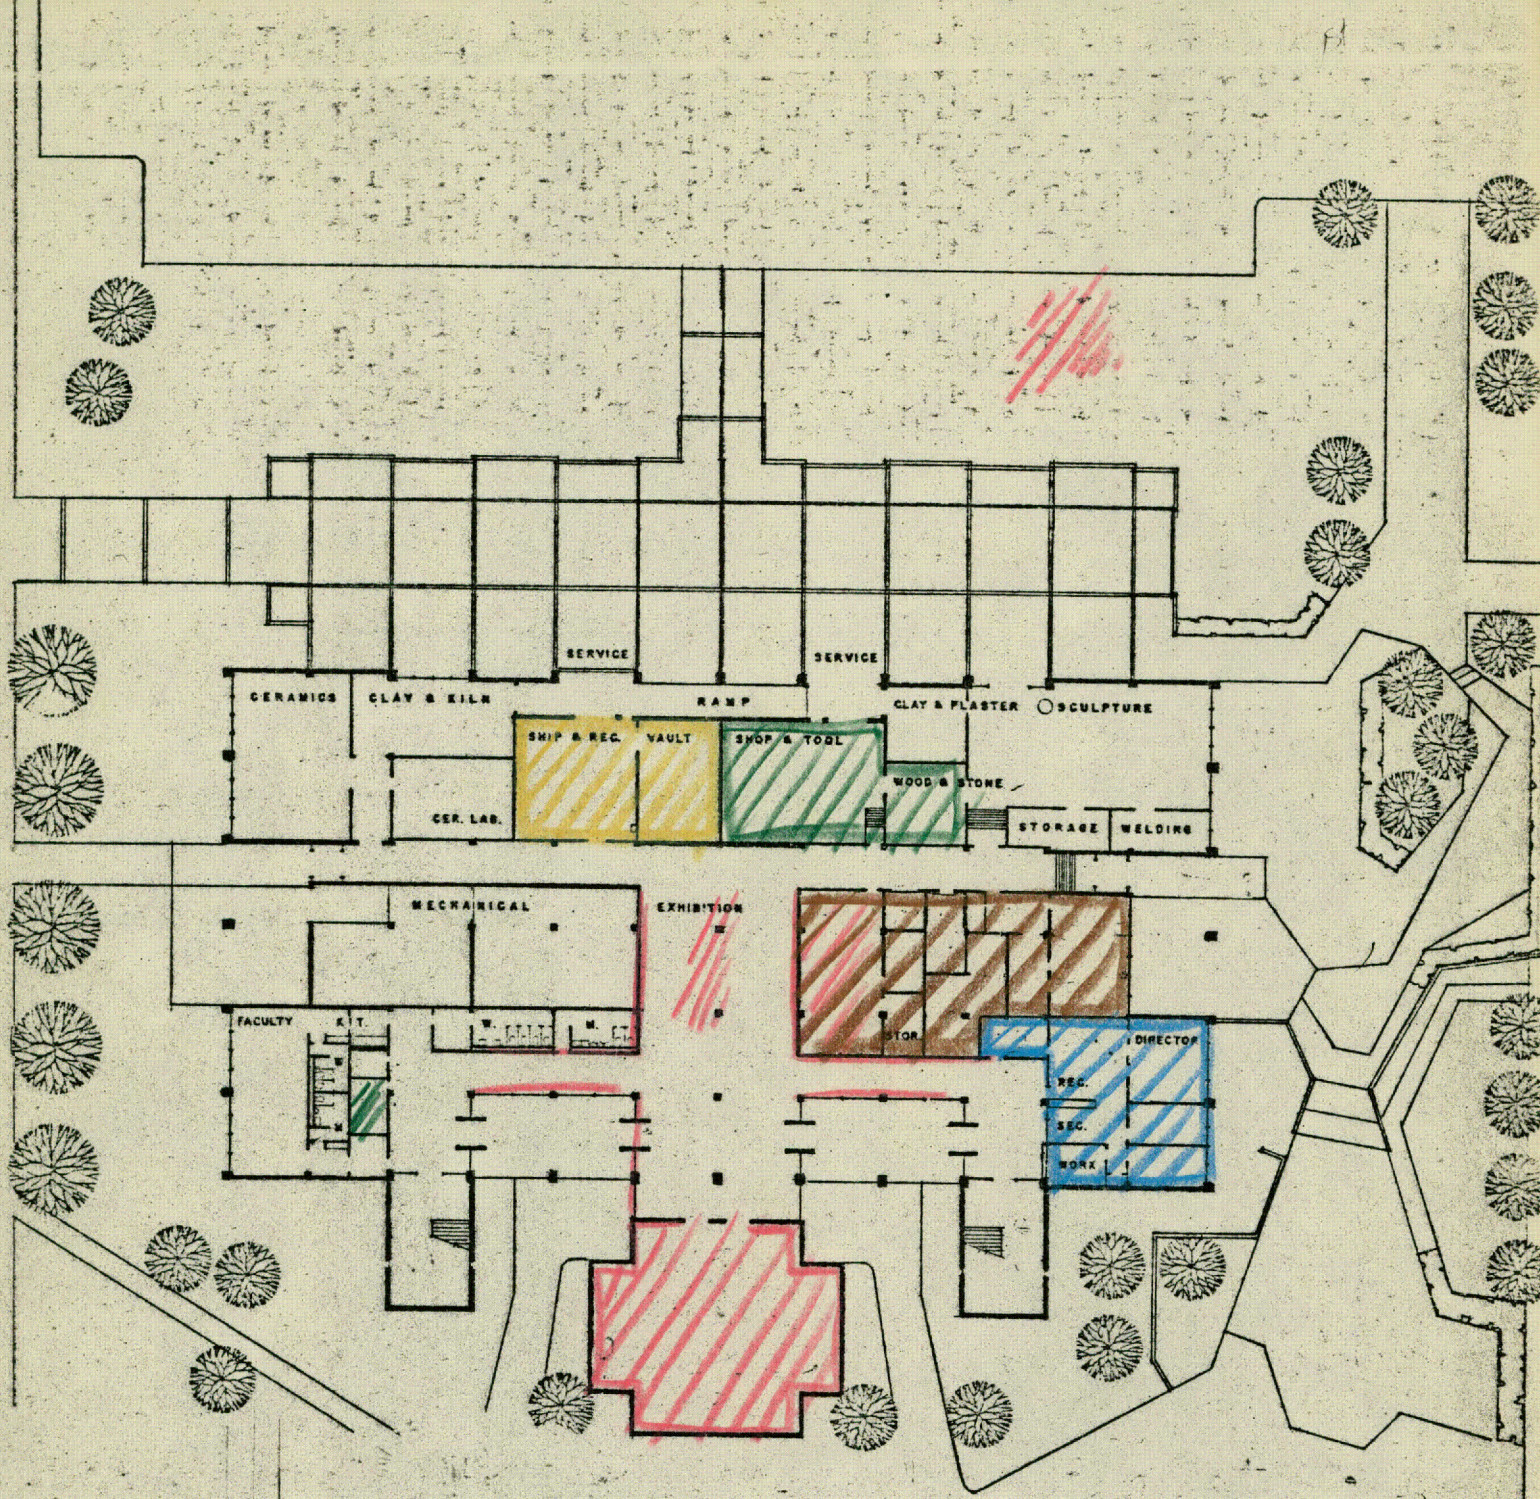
shows a plan of the first floor of the Art Building; Figure 6, the second floor; and Figure 7, the third floor. Spaces assigned to the interior design program and shared spaces are shown. Figure 8 shows the plan of a house at 1219 Highland Street which has been assigned to interior design students for use as a practicing design studio.
